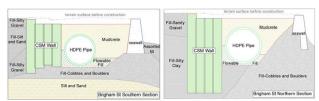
Cross-sections – Southern Section and Northern Section of Brigham Street
